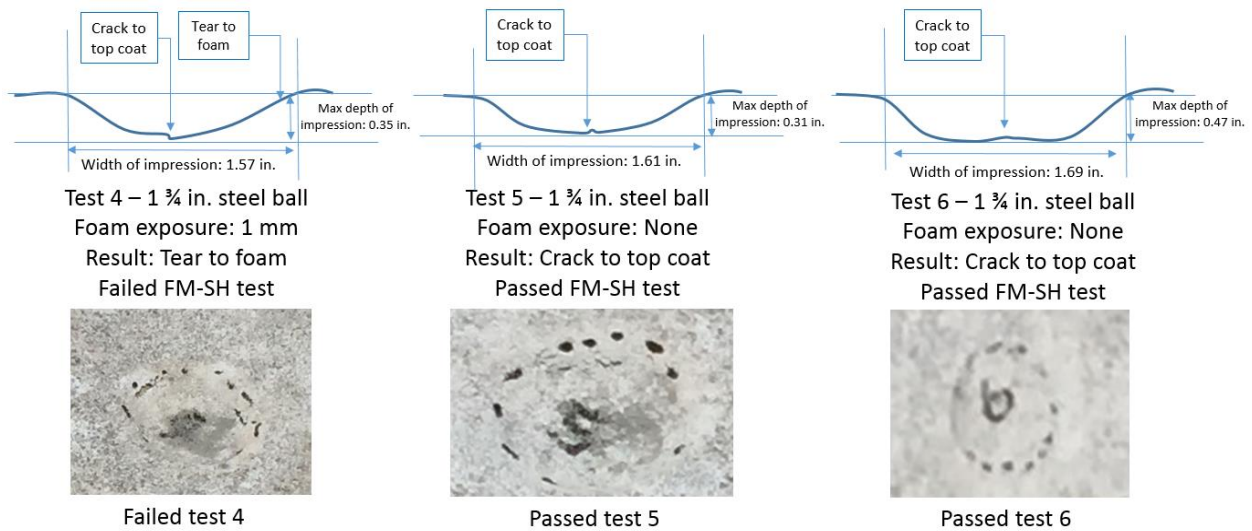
1 ¾ in. hail tests that tore to the foam or cracked to expose the top coat.
